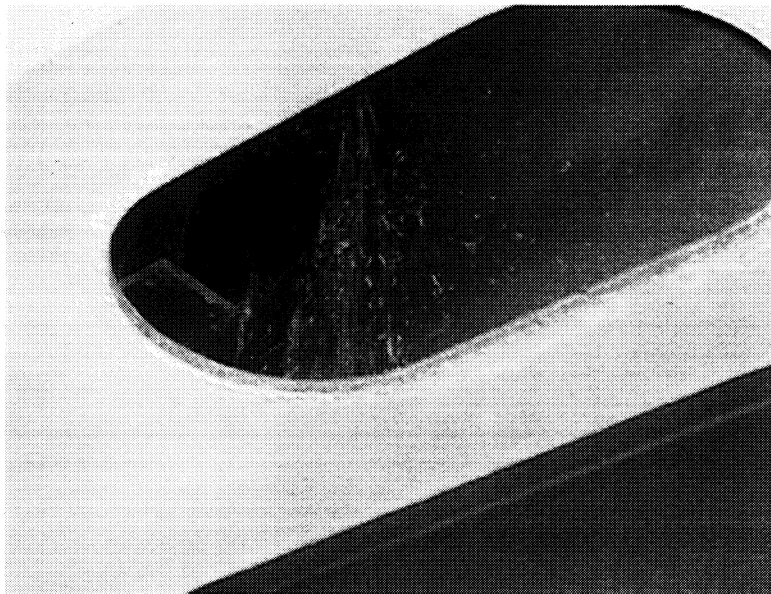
Welded Attachment at Interior of Box Section of Main Truss
